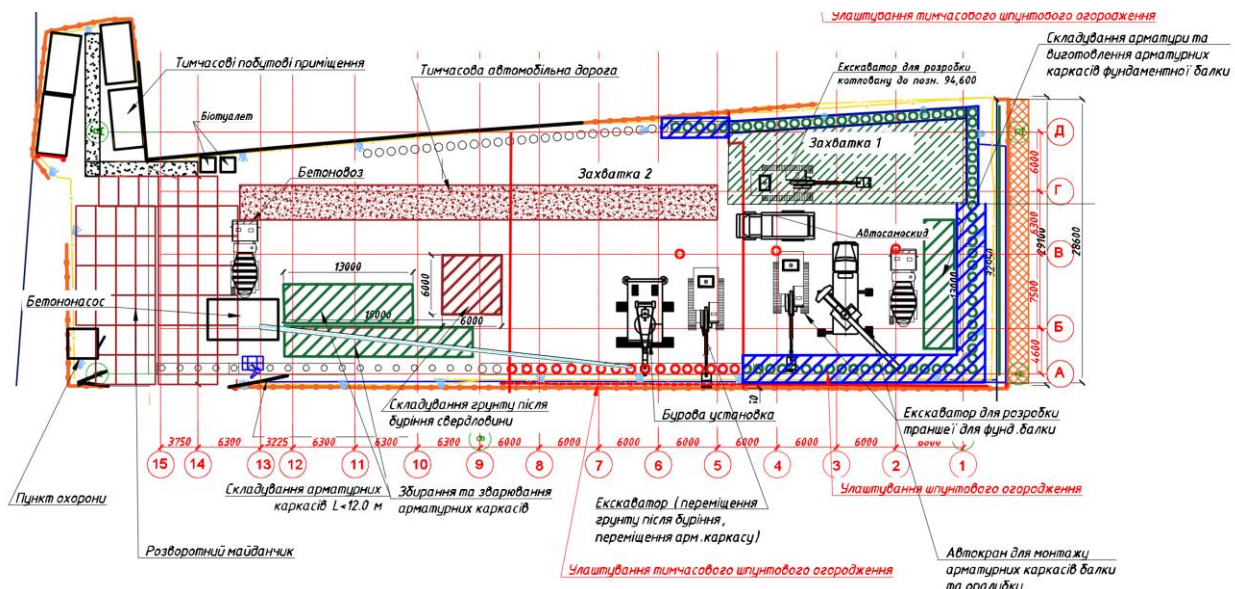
Organization of the construction site at the stage of installation of sheet pile wall of the pit within the axes 1–9. Author's drawing
